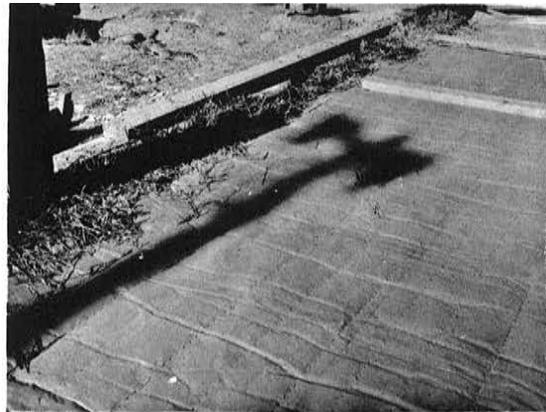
Spun glass insulation blankets placed directly on unformed concrete surfaces at Kirwin Dam. Rolls are 10'x25'x1". Note loose straw covering concrete between keyways along contraction joint. Heavy planks hold mats in place.
